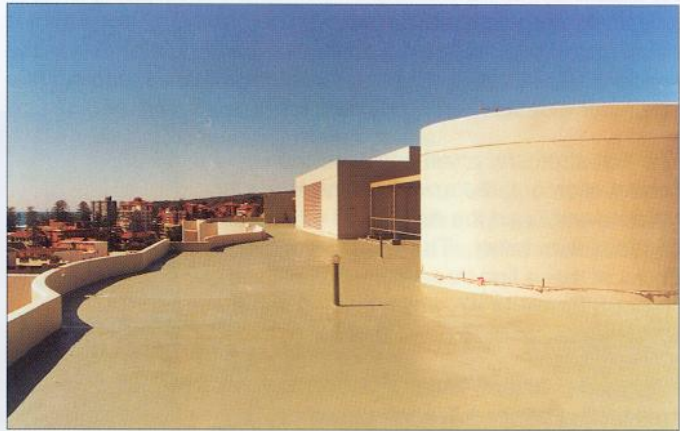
RADCON #7 TREATED FIRST, THEN PAINTED
